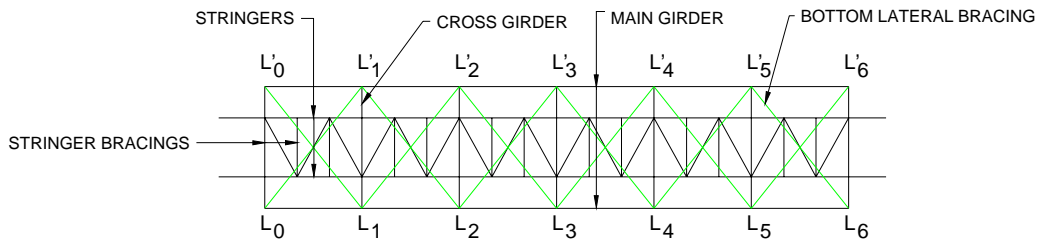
Bottom plan showing bottom lateral bracing, stringers, cross girders and stringer bracing
